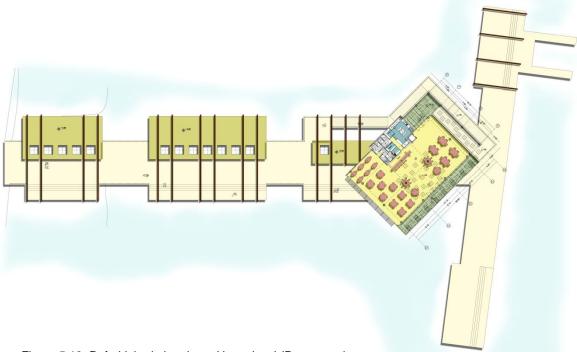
, Refurbished pier plan – Upper level (Restaurant)
